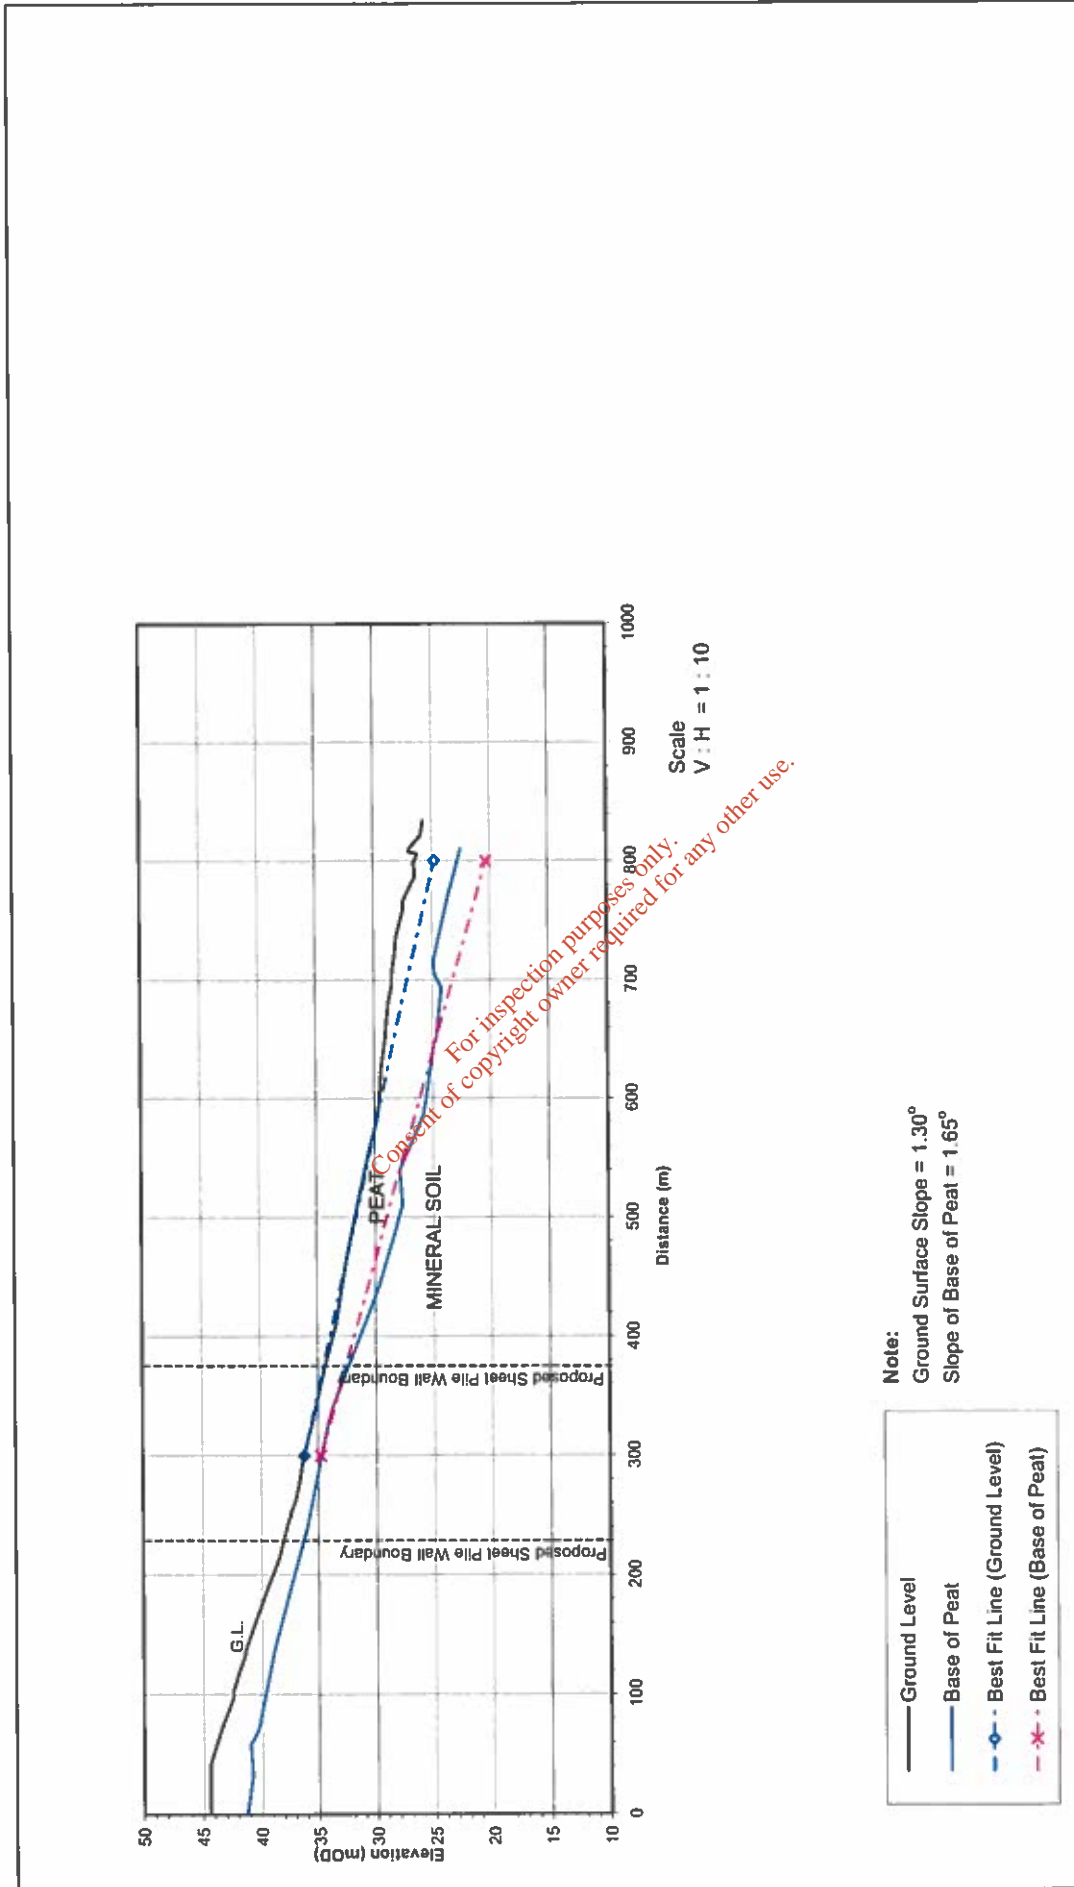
Typical Cross-section along Eastern Area and Temporary Construction Facility (Cross-section 4)
